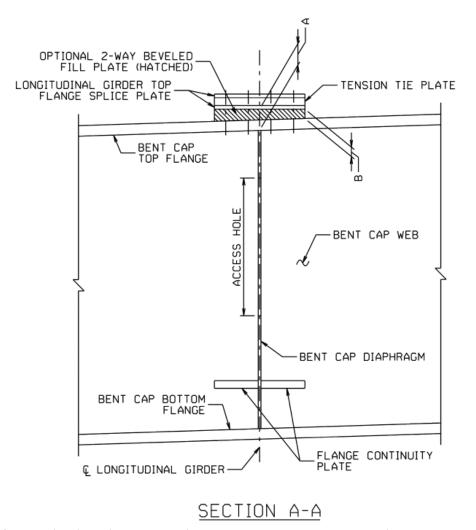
Longitudinal girder connection to steel box bent cap, cross-section
